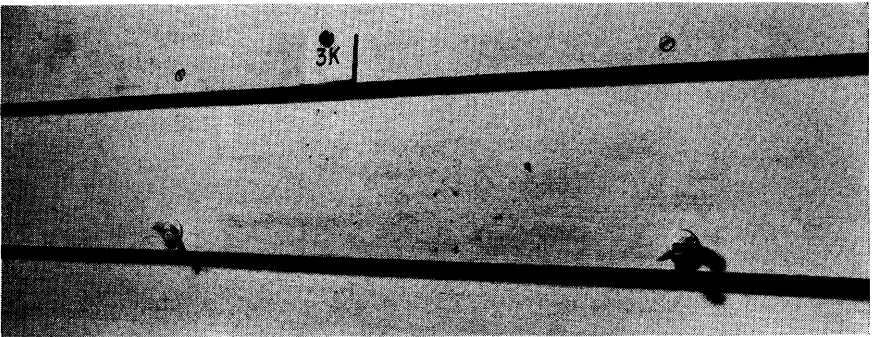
Close-Up View of Second Board from Top of Wall 3K
